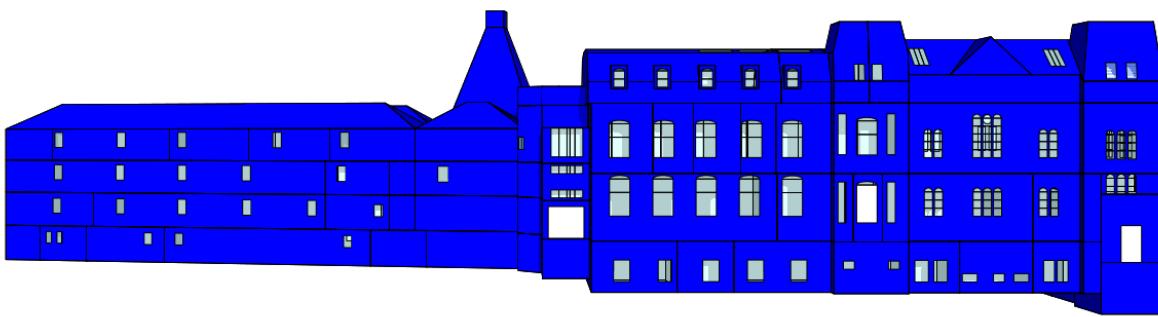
IES model geometry for Minto House, showing building structure and glazing. Viewed from the south-facing elevation towards Chamber's Street.
